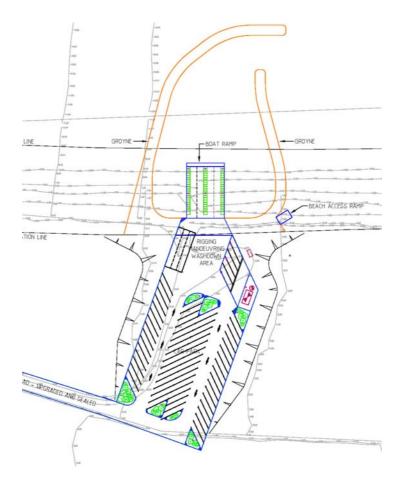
Previously Proposed Ramp and Car Park Layout
